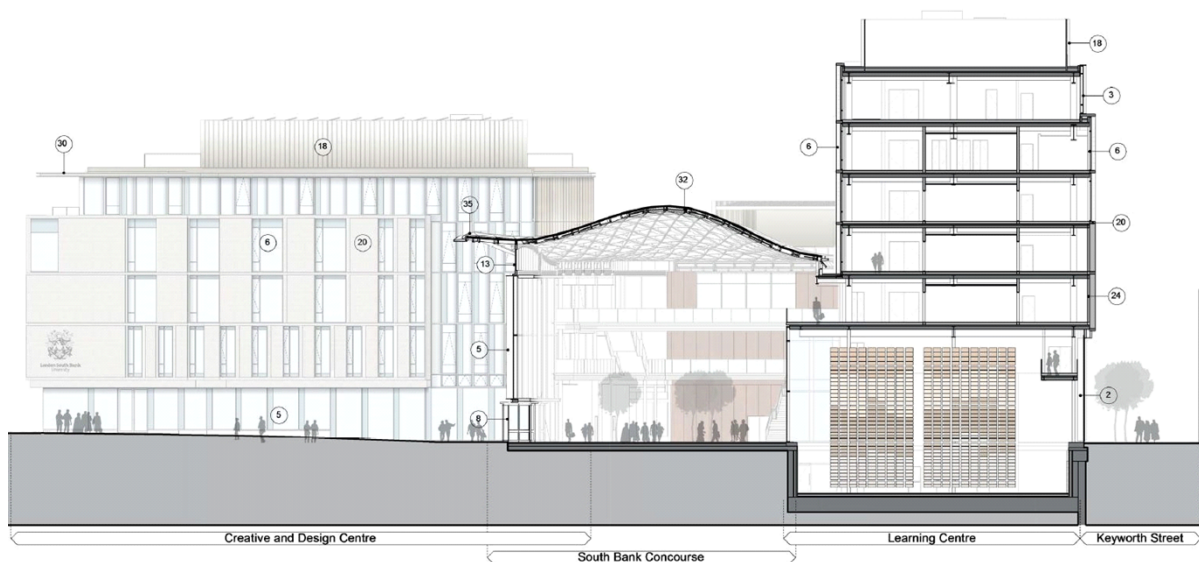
Cross-section west-to-east through the site. As shown, the concourse sits in-between the Creative and Design Centre (left) and the Learning Centre (right), and provides a pedestrian link through the site from London Road to Keyworth Street.
